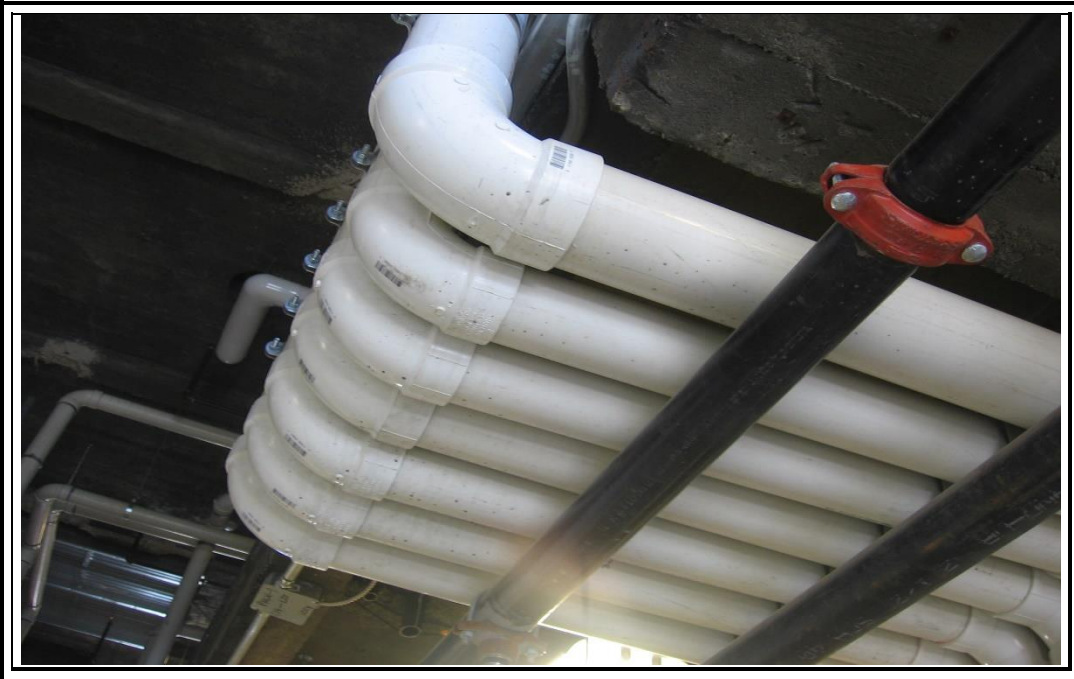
Riser piping for individual subsystems extending to/through the building roof (12/3/20).
